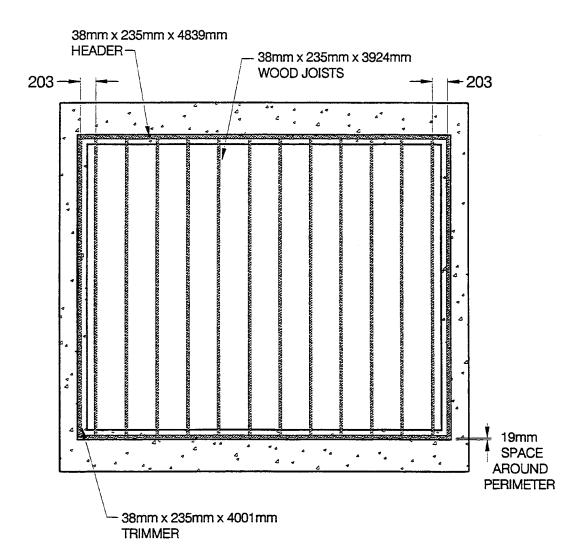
Layout for joists 406 mm o.c. with joists symmetrically disposed about the midline of the floor opening — 14 joists.
